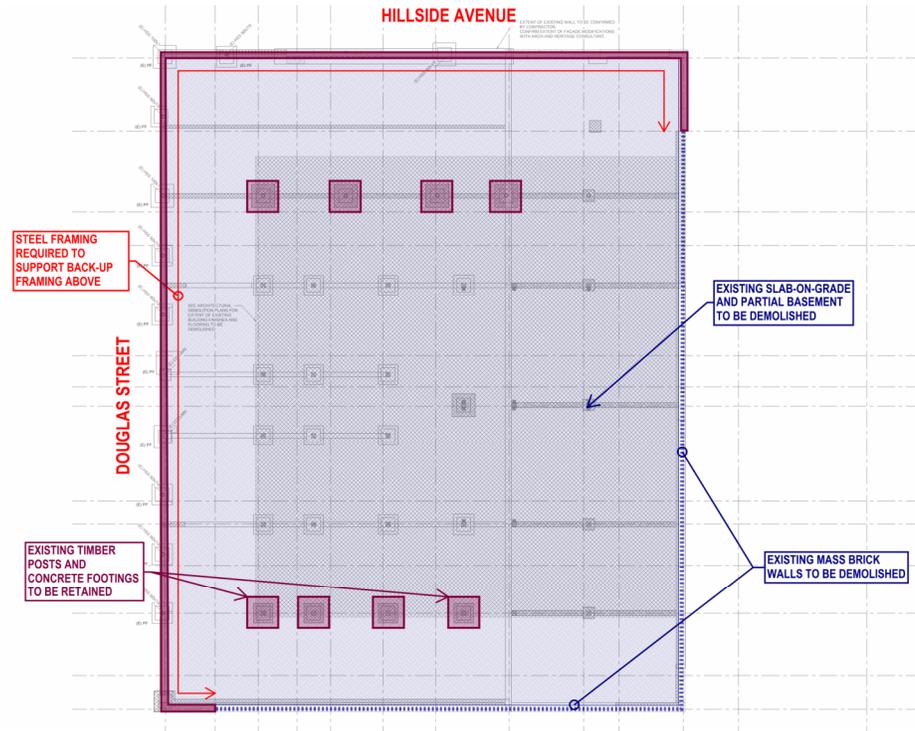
Ground Floor Heritage Retention Plan (As Proposed by Developer)
